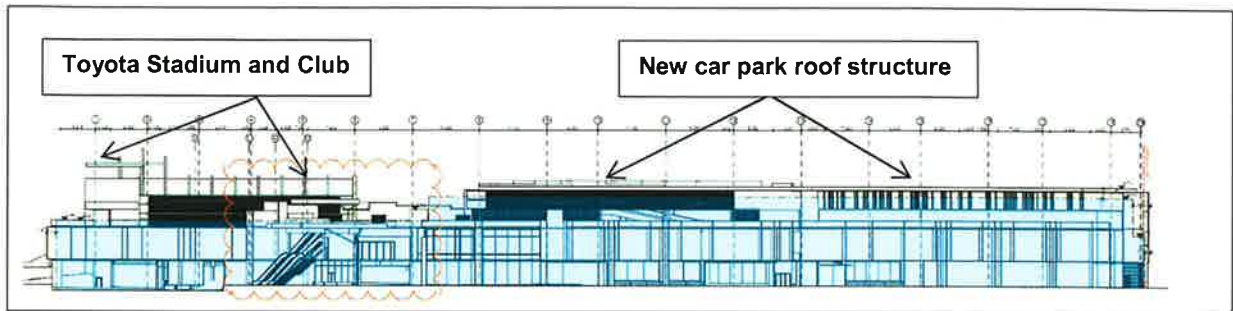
Southern elevation (Captain Cook Drive) – approved envelope shaded blue (Source: Proponent's modification application, 2016).
